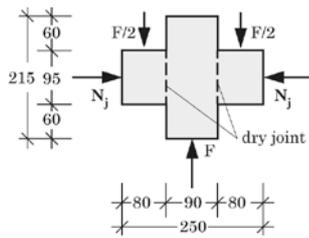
Test specimen for the determination of the load-bearing behaviour of dry joints under cyclic loading (dimensions in mm)
